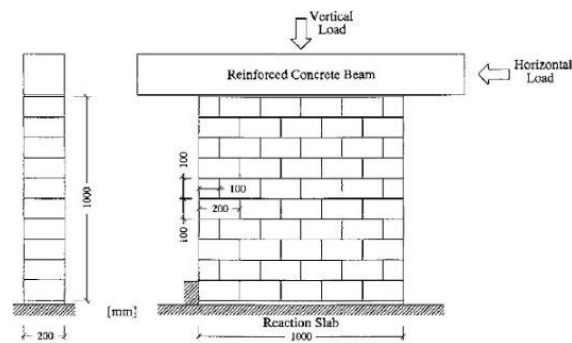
Adopted geometry for the dry stone masonry walls and schematic loading arrangement [1]
